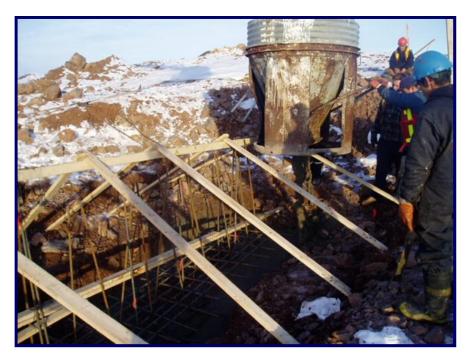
September 20, 2005 Concrete hopper used to place the concrete in the foundation trench excavation.
